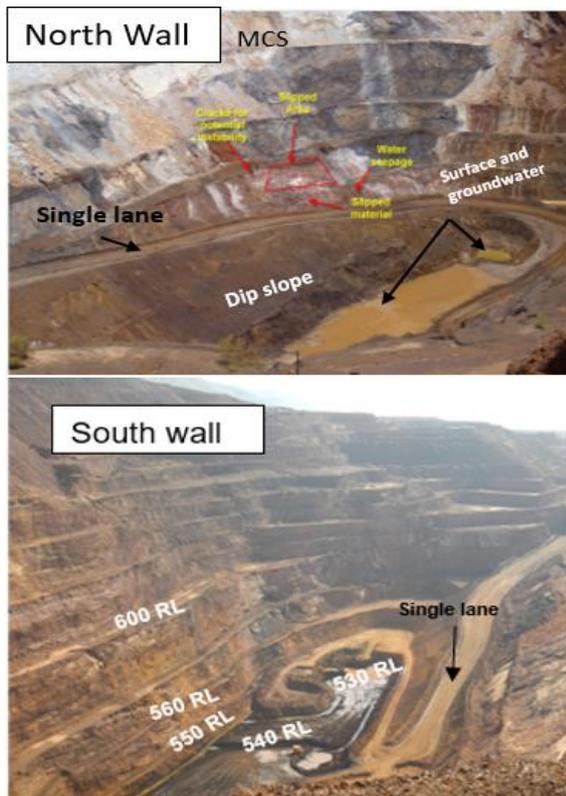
BS2 Pit North in McRae Shale (MCS) and South Wall Dales Gorge (DG) BIF Unit
